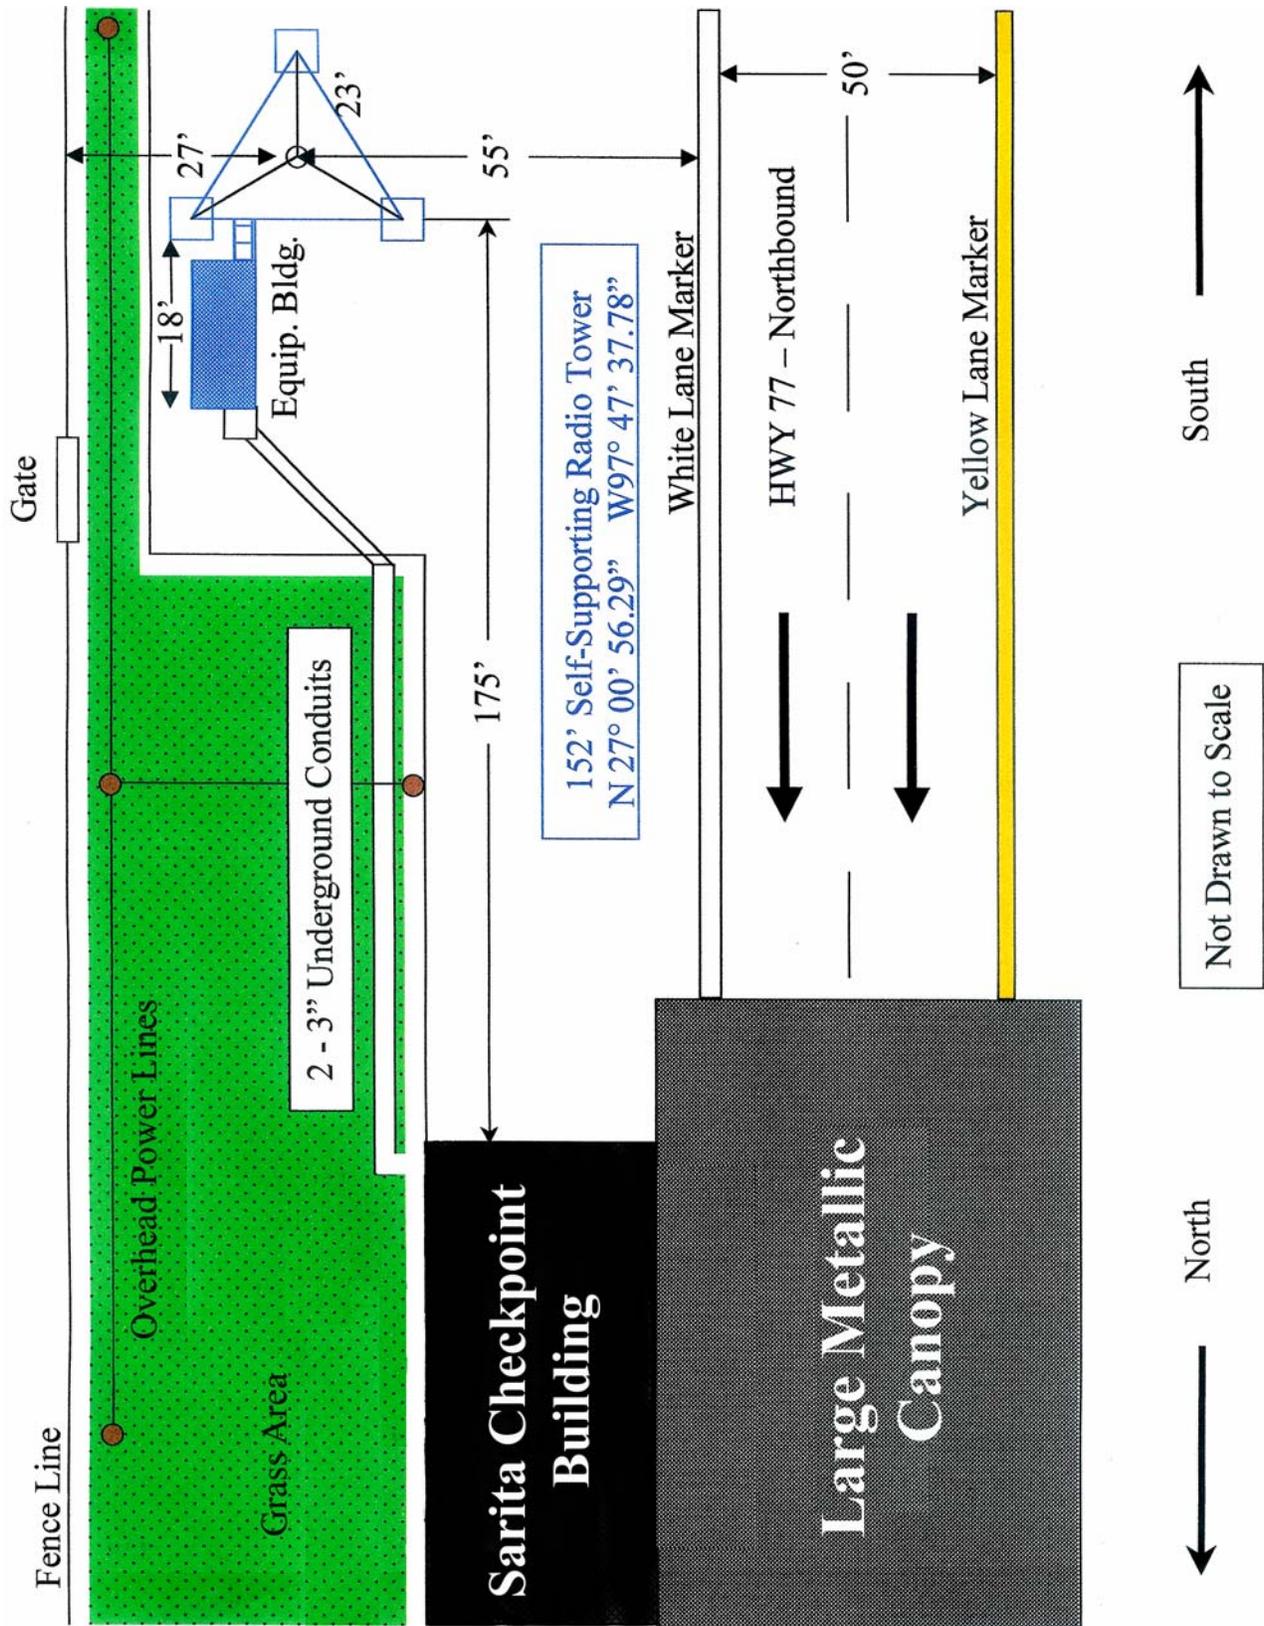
SITE LAYOUT OF SARITA CHECKPOINT (PROPOSED CONSTRUCTION IN BLUE).
